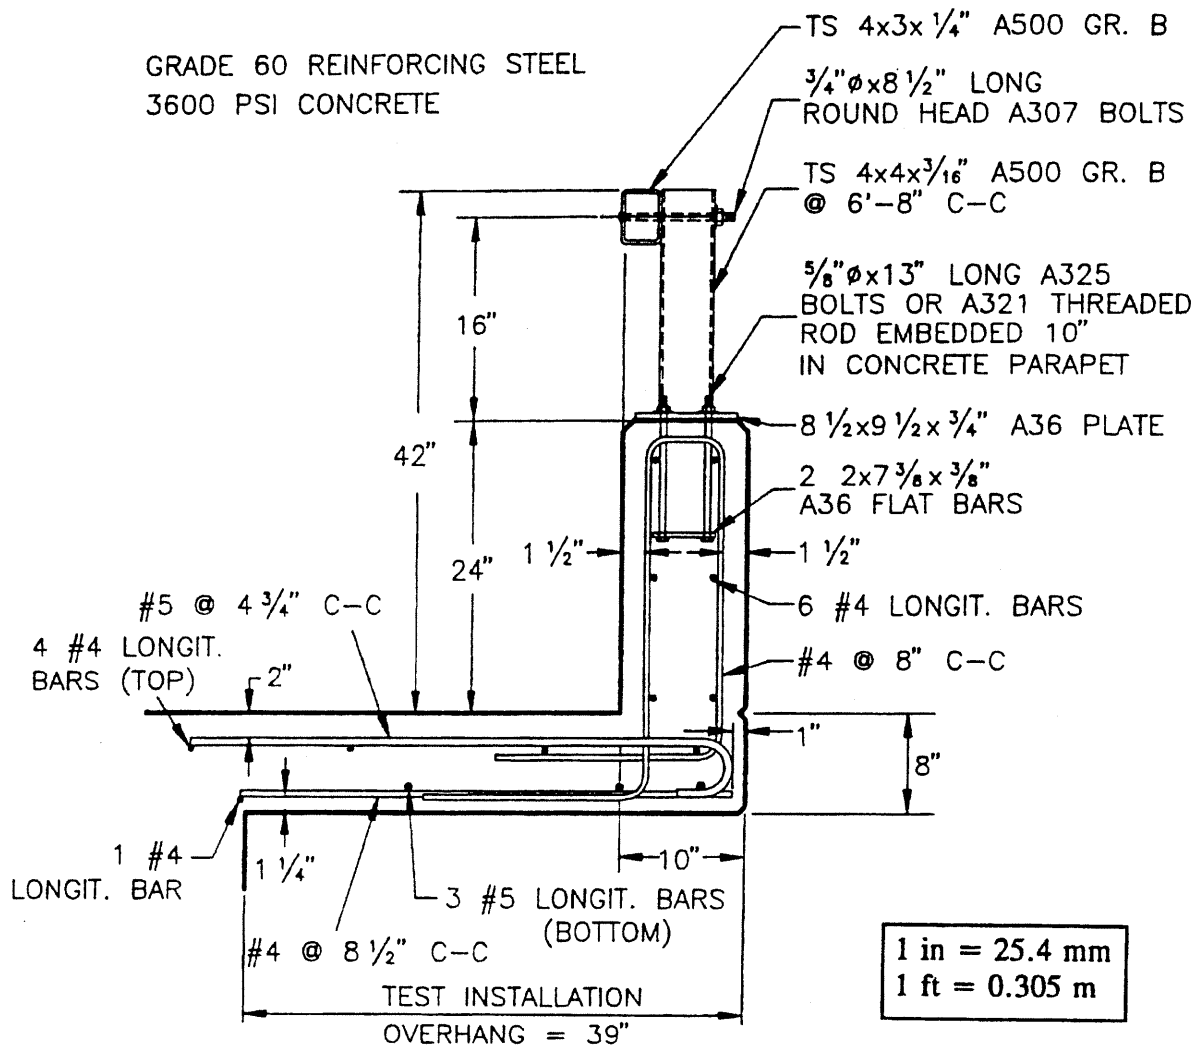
BR27C Flush Mounted Bridge Railing (8,40,42).
